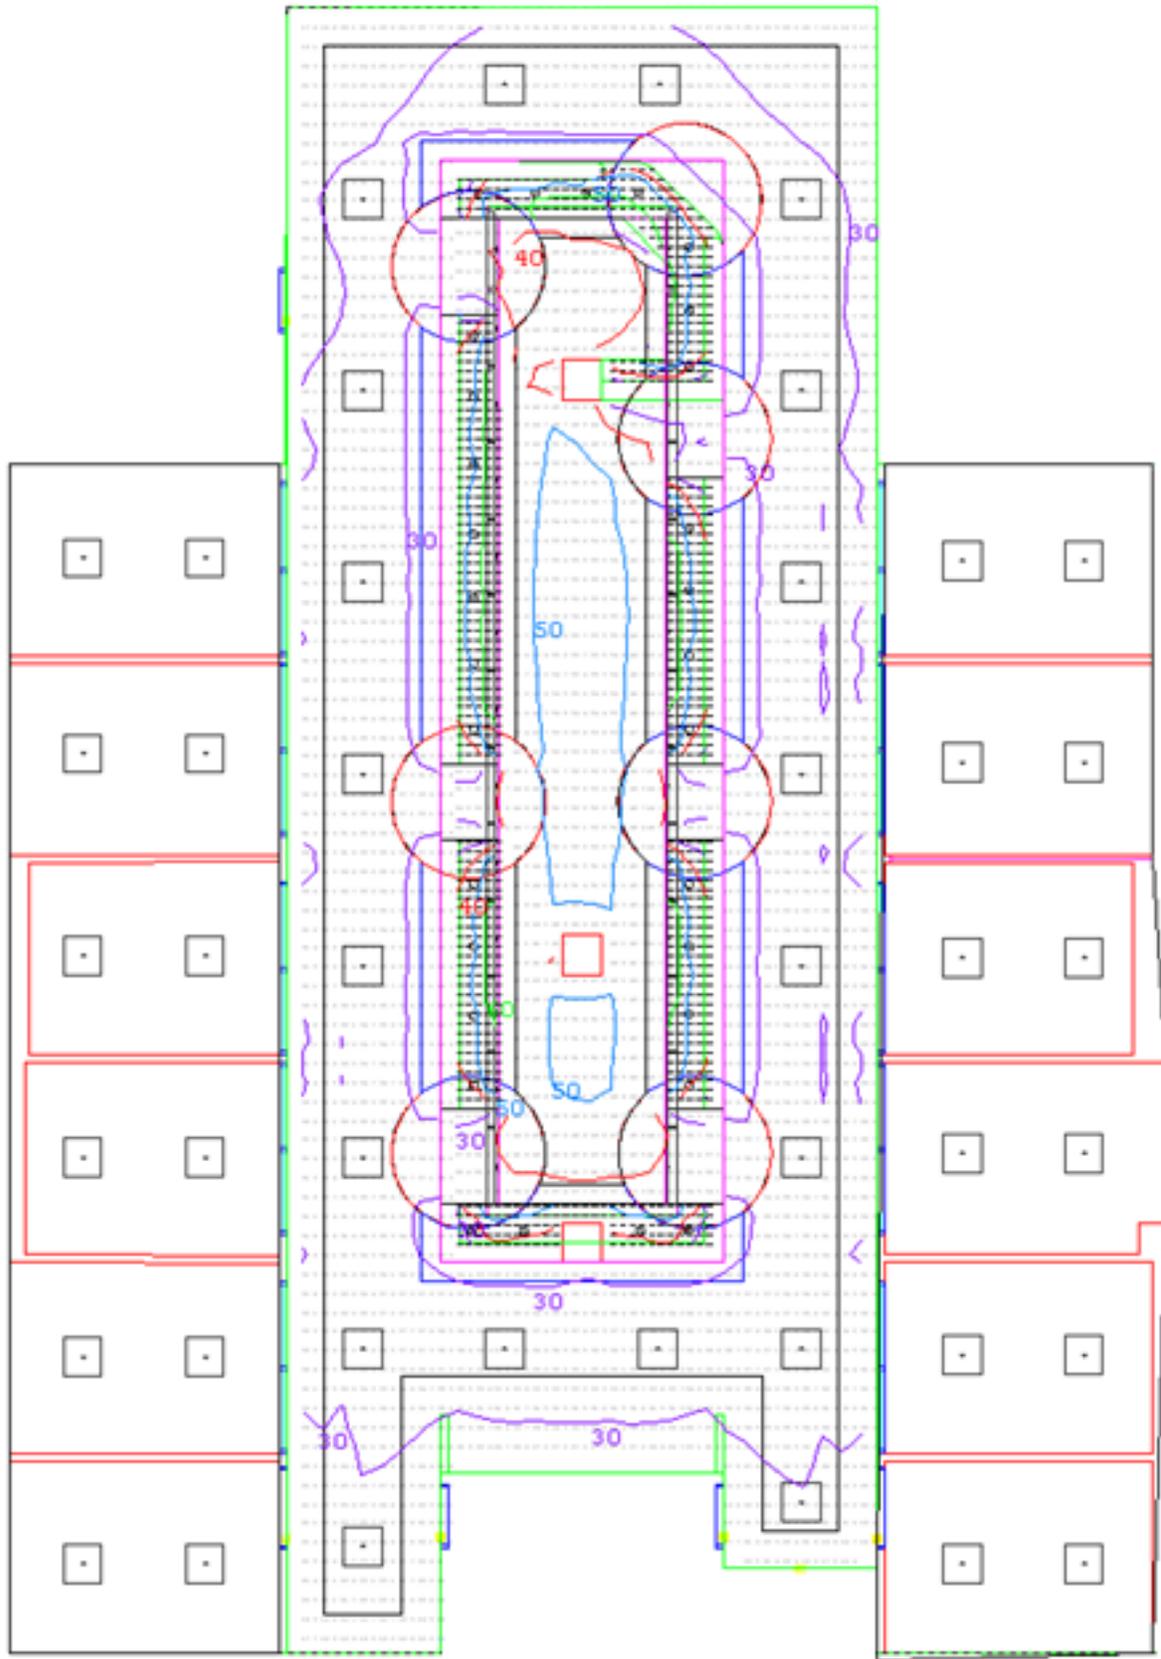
| 50% Dimmed Team Station Plan Pseudo Color and Render (fc)
